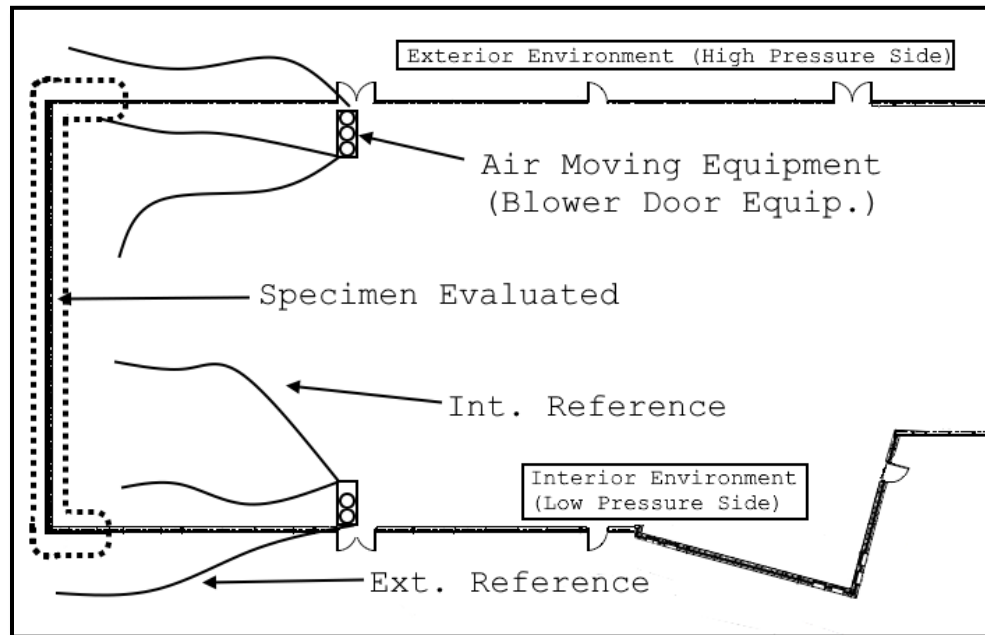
Example Plan Layout for Equipment and Reference Tubes
